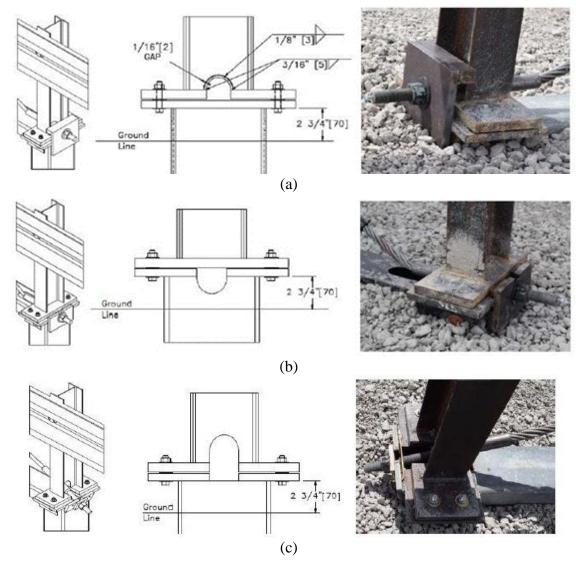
Candidate Design Concepts: (a) Concept Nos. 1&4 – Cable Through Upper Post, (b) Concept No. 2 – Cable Through Foundation Tube, and (c) Concept Nos. 3&5 – Anchor Cable Through Foundation Tube with Angled Bearing Plate
